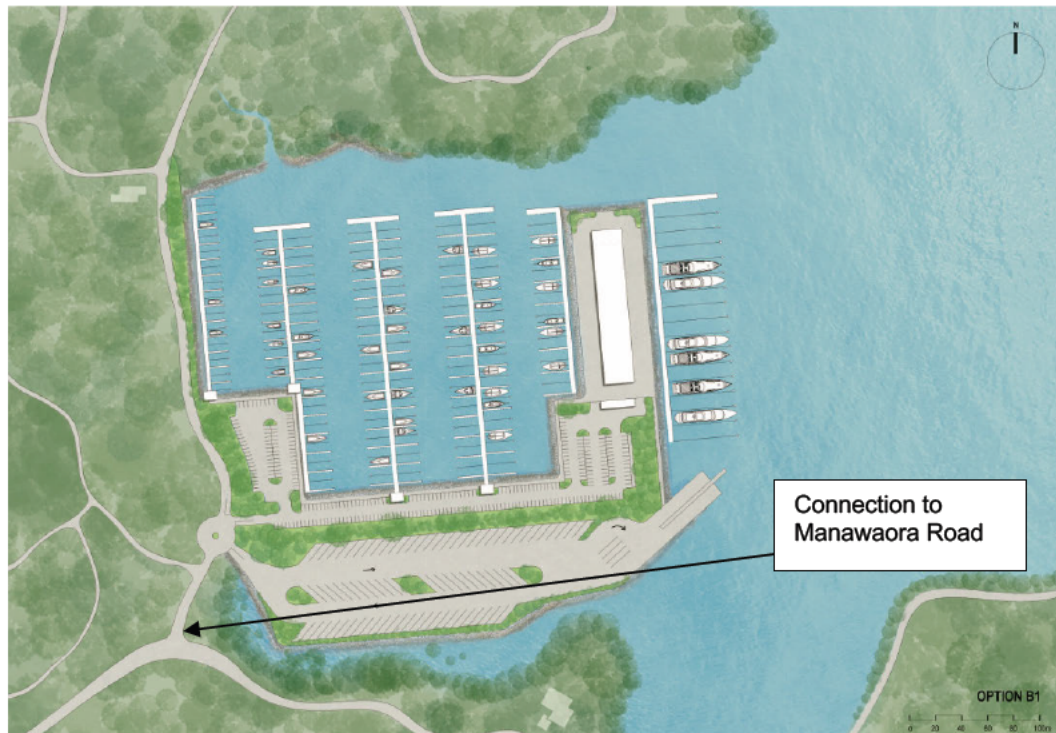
Plan of proposed development – Waipiro Bay Marina
